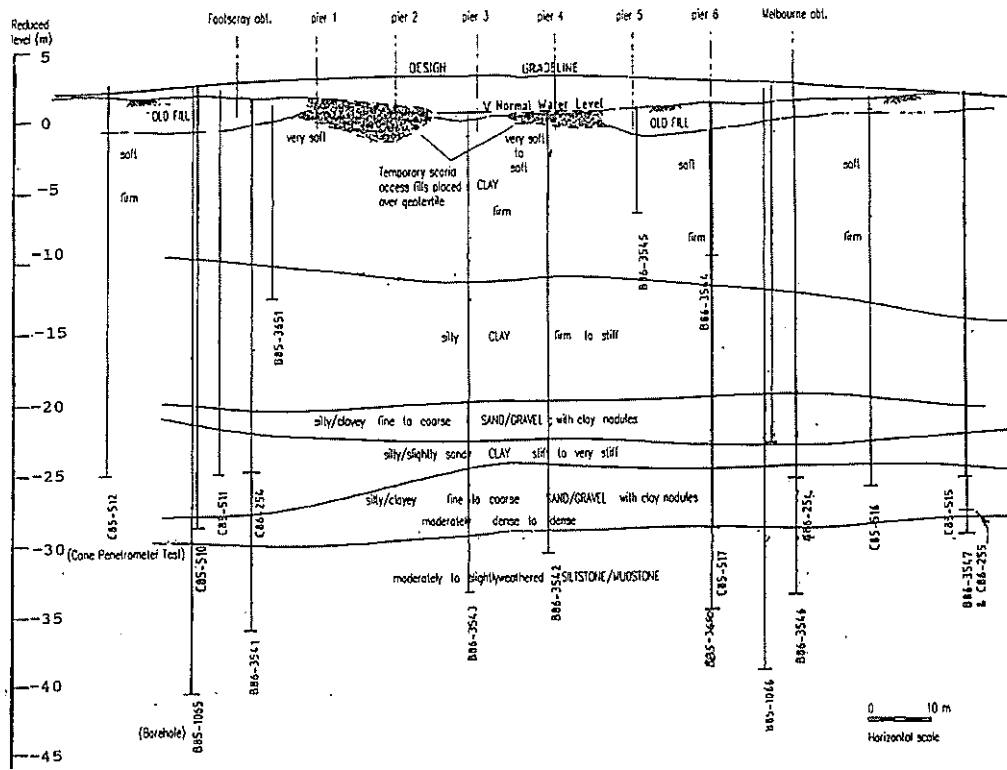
Sub-surface soil profile - Moonee Ponds Creek bridge site.
